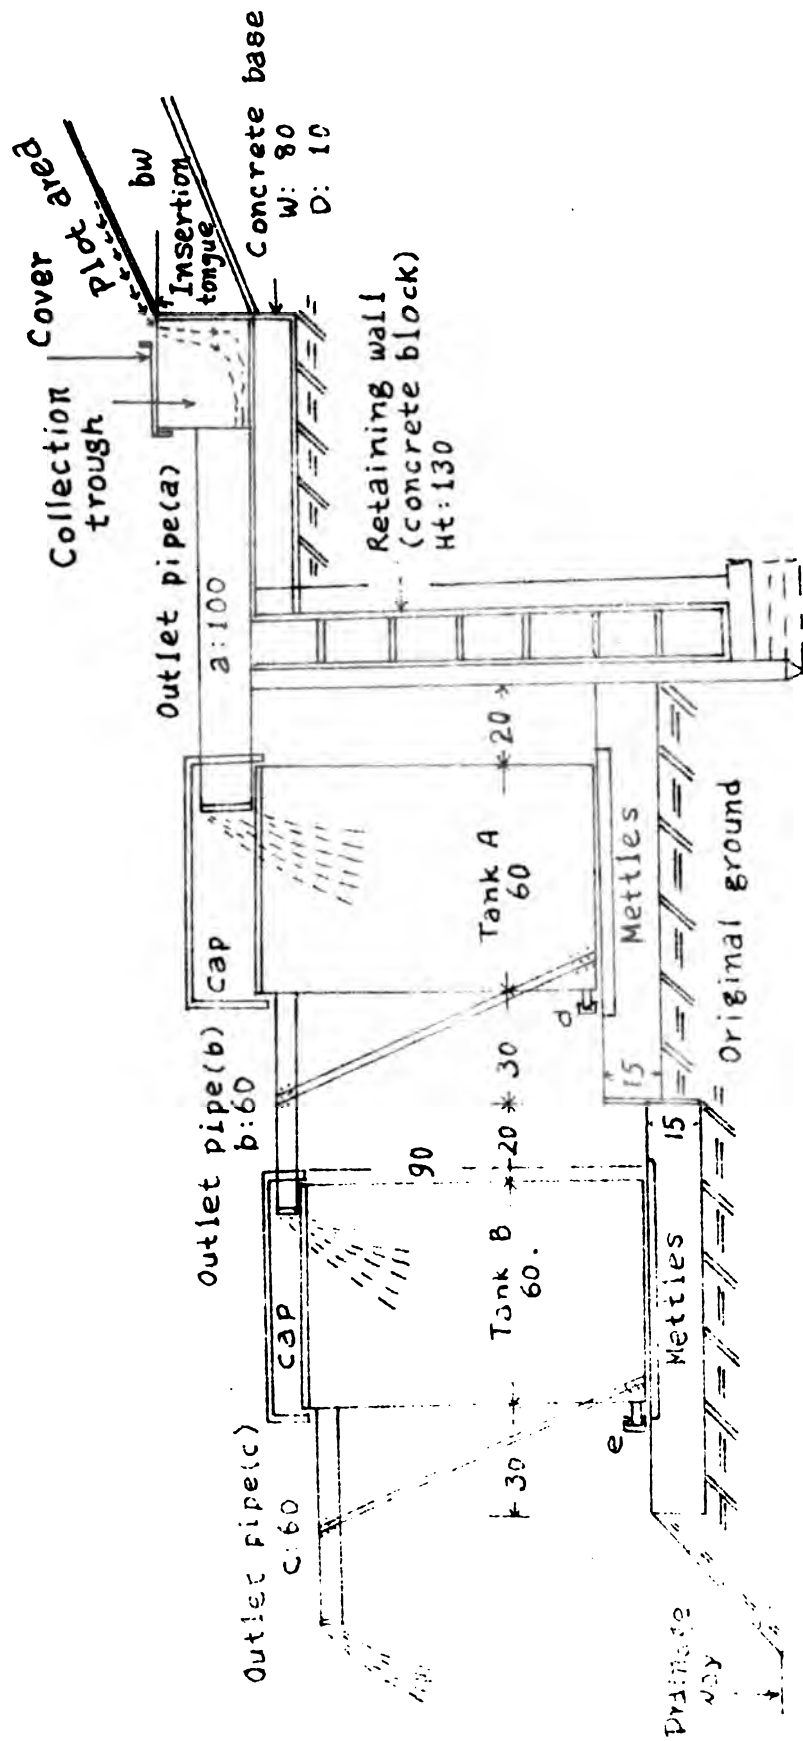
Side view of tank A & B, outlet pipe a, b, c, d, e, trough, retaining wall, and concrete base (Unit : cm)
